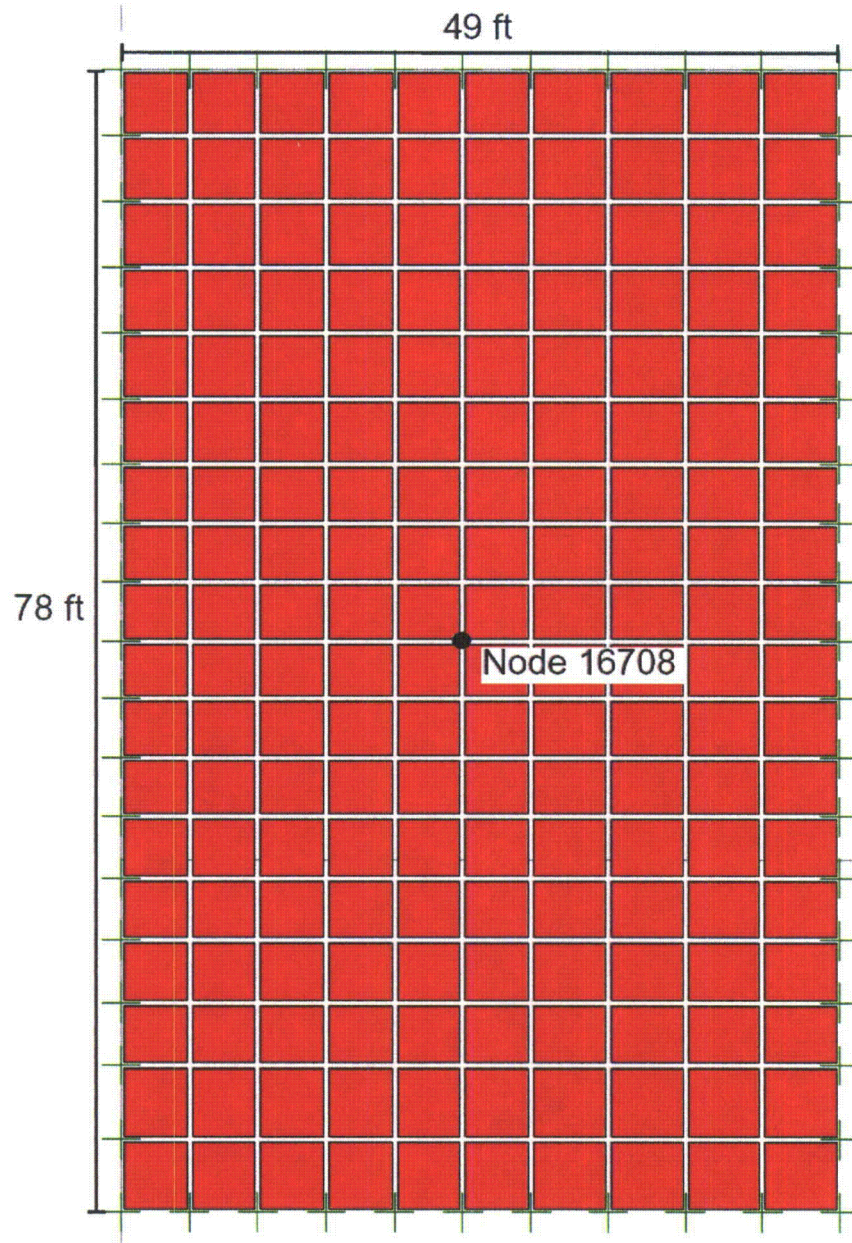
Slab model (dimensions equal to one bay of Pump House Roof).
